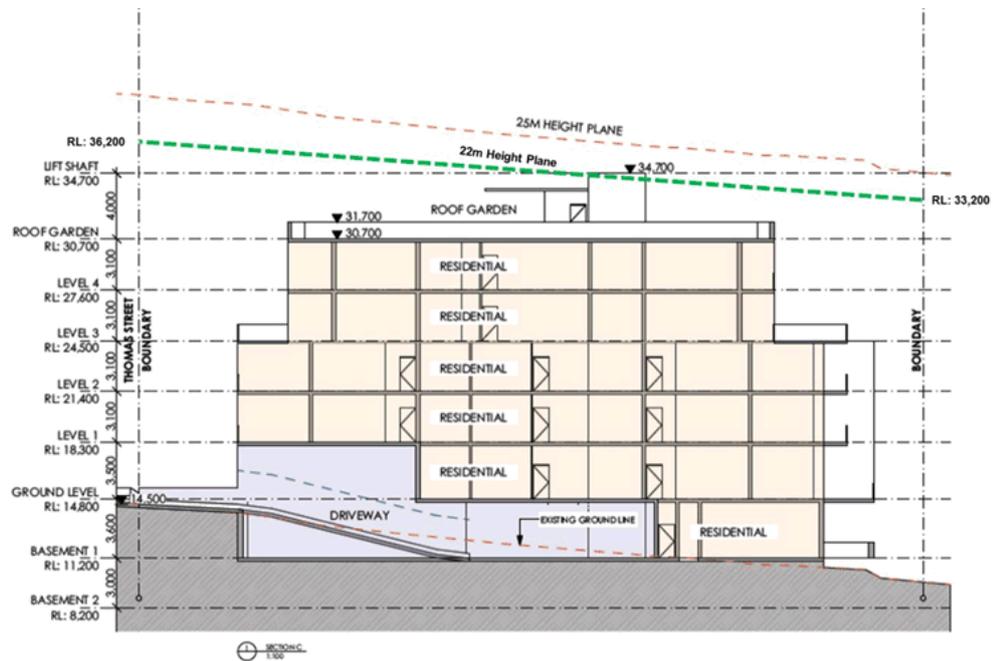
Section facing east from adjacent townhouse development (Source: PTI Architecture)
